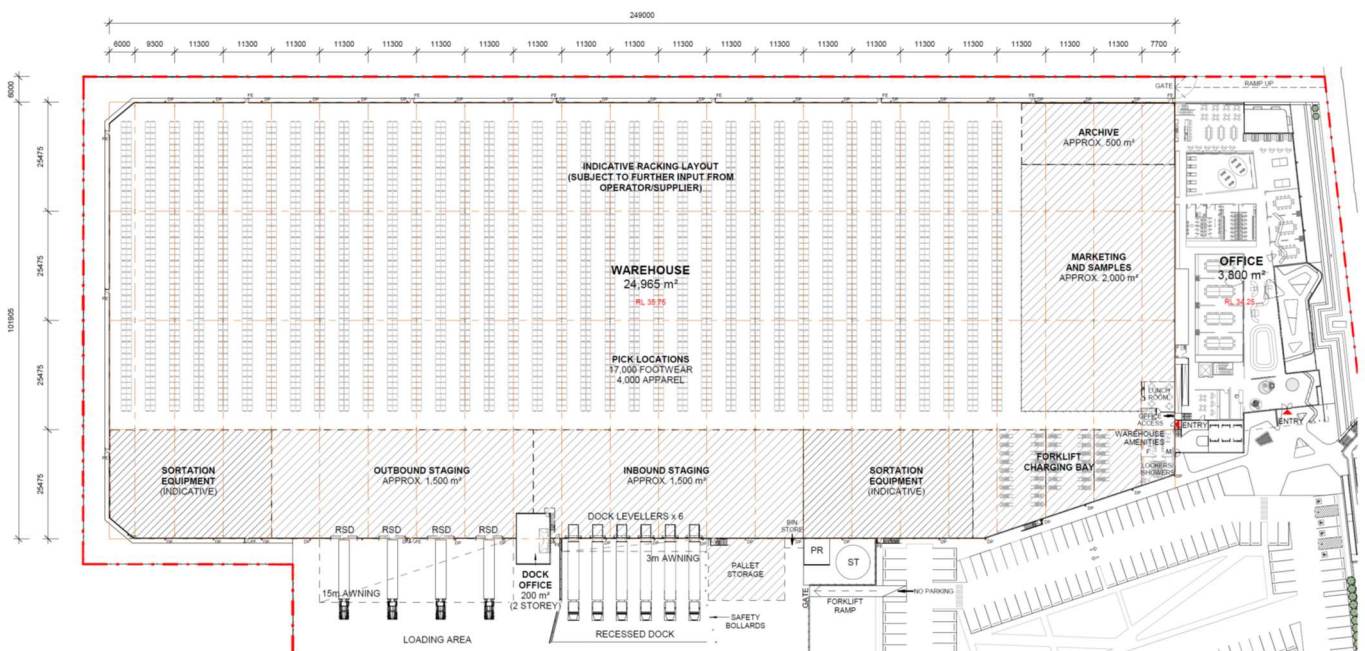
Floor Plan – Warehouse (Source: Reid Campbell)
